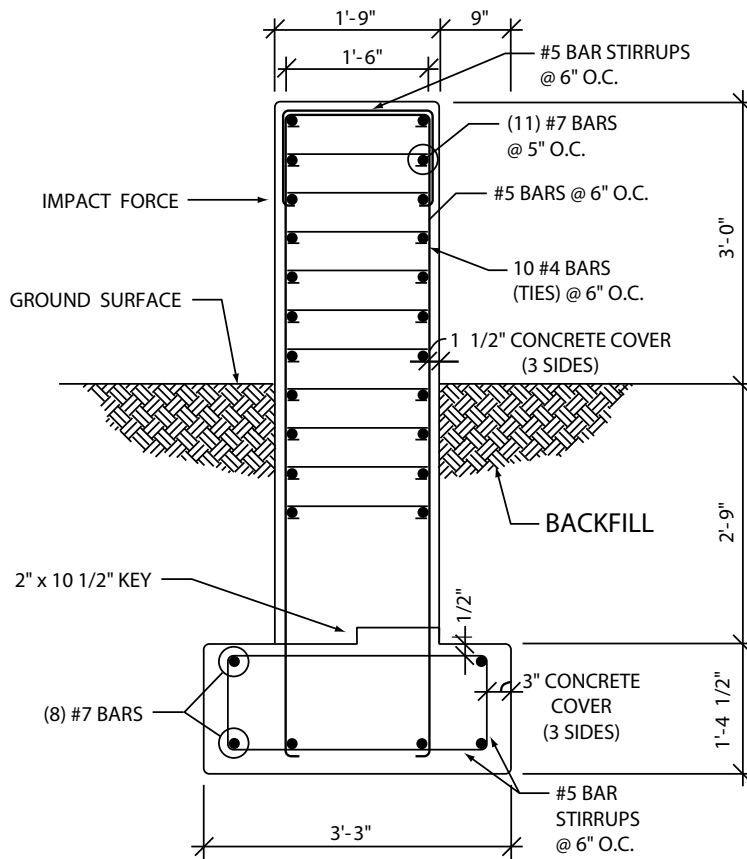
Concrete retaining wall used as barrier for 15,000 lb. vehicle traveling at 30 mph.
